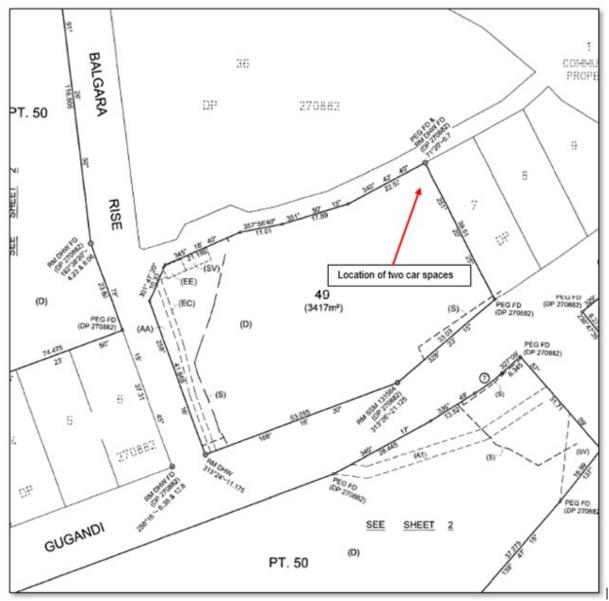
Extract of DP relocation of proposed two car parking spaces on adjoining land being Lot 49
